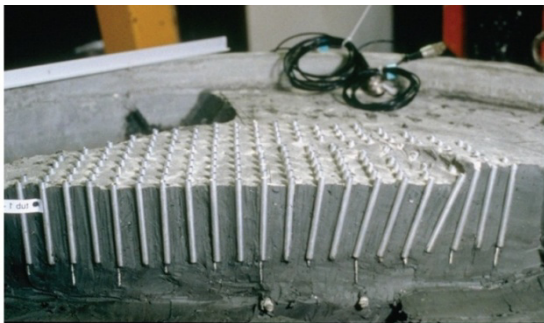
Deformation of the foundation system of Rion-Antirion Bridge after centrifuge test
